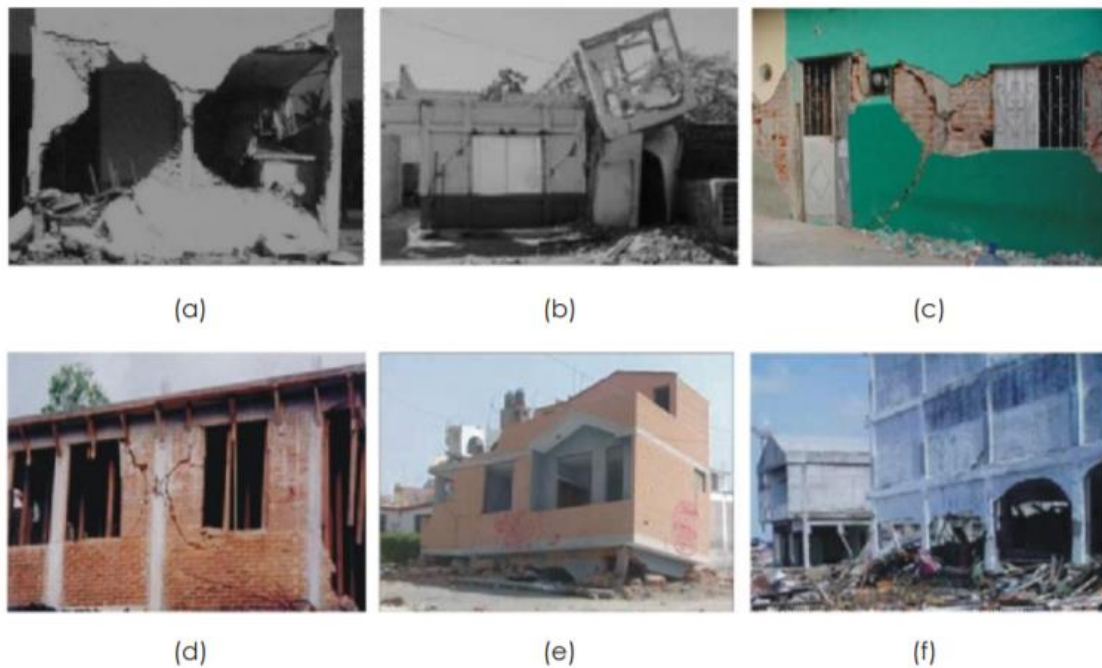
Damage to confined masonry buildings during various earthquakes.
